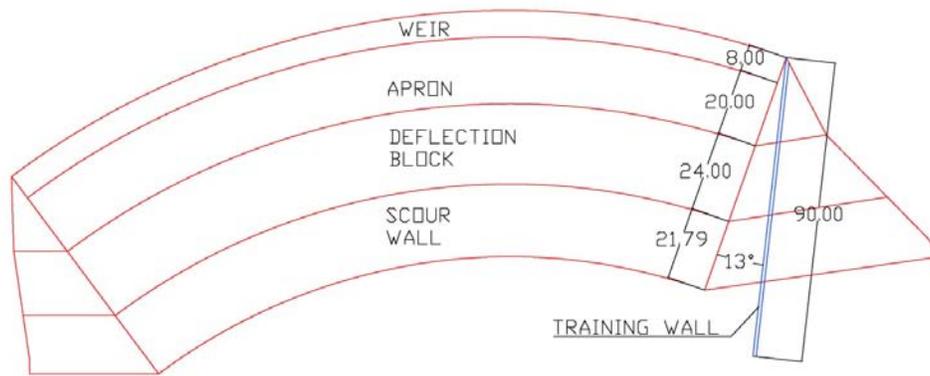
Plan view of the fish barrier showing location and dimensions of the recommended training wall.
